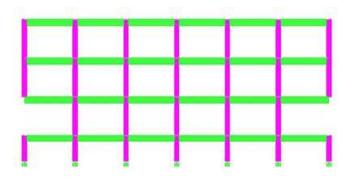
Elevation view of G+3 building with floating columns at corner of exterior frame
